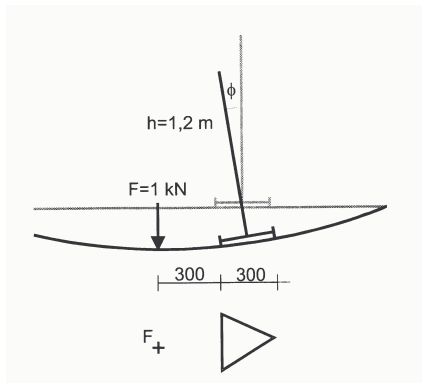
Determination of the slope of the top surface of the floor due to 1 kN point load.
